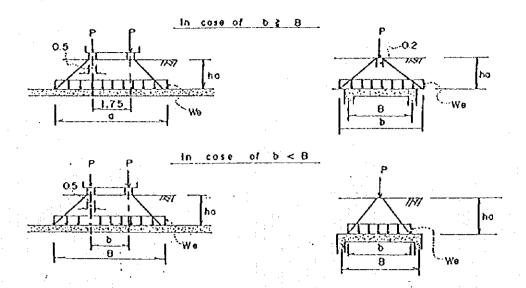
Vertical Load on Top Slab of Conduit due to Live Load
